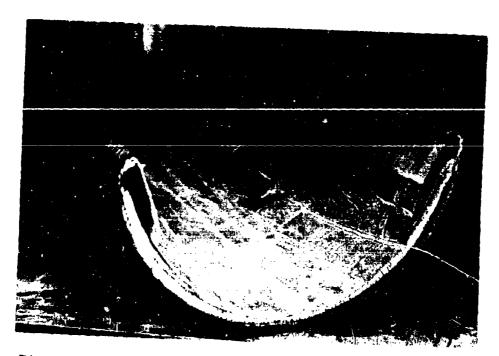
Collapsed Cylindrical Test Specimen, c.(1)
